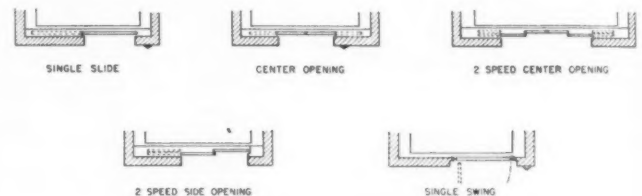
TYPICAL ELEVATOR ENTRANCES
